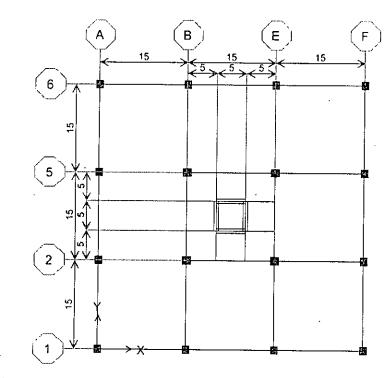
Plan view of ground floor in 15'x15' floor panel model
